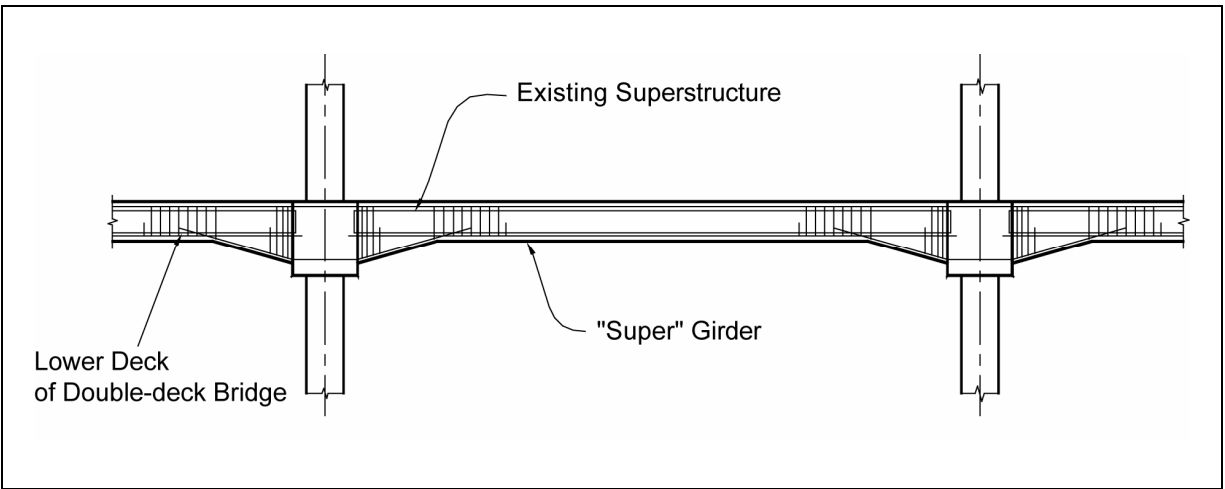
"Supergirders" added between piers to reduce torsion in pier caps.
